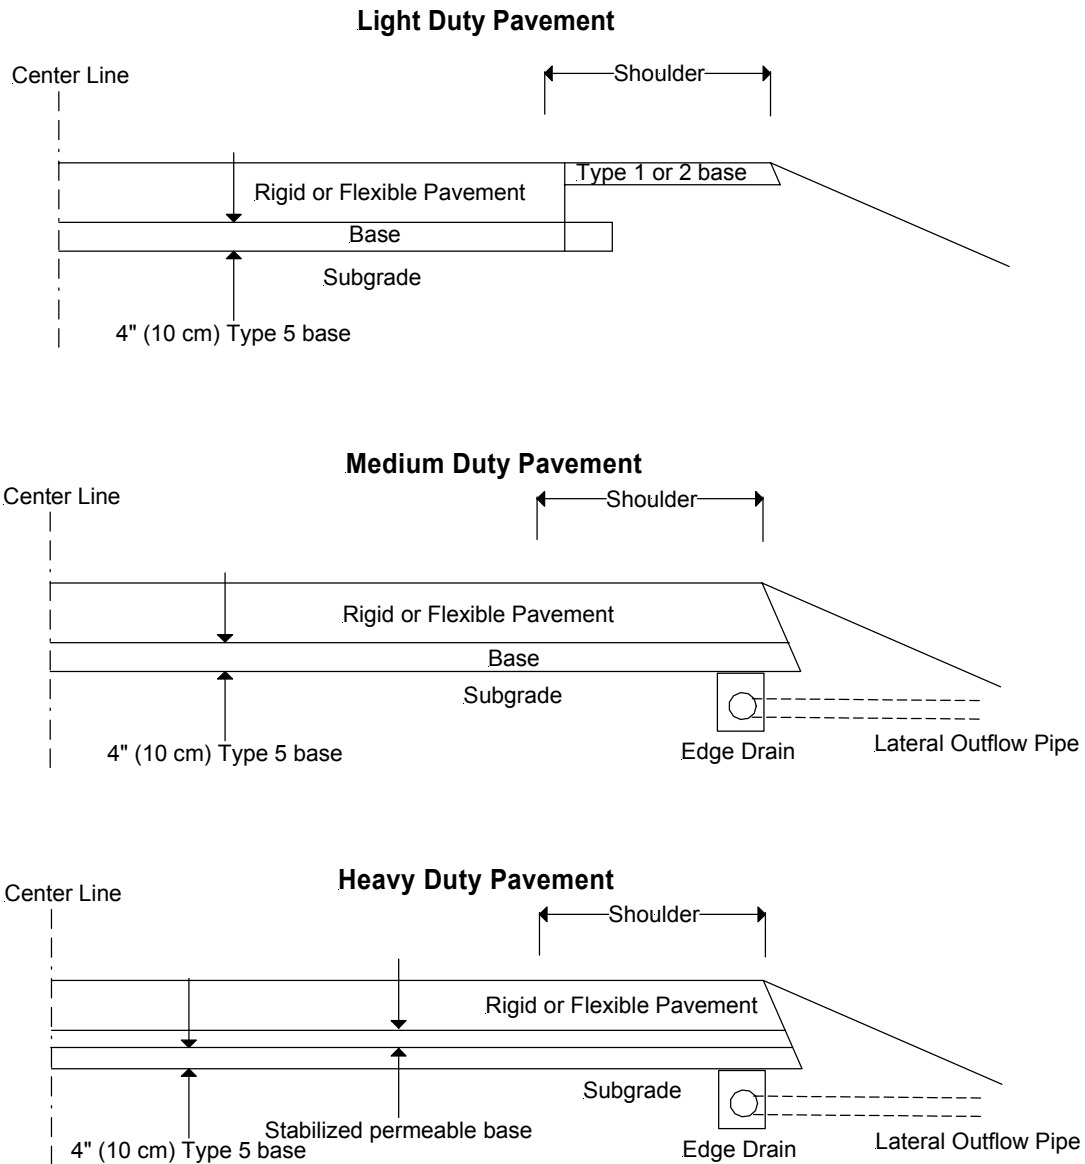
The three pavement design cross sections used in MoDOT system (a) Heavy-duty, (b) Medium-duty, (3) Light-duty.
